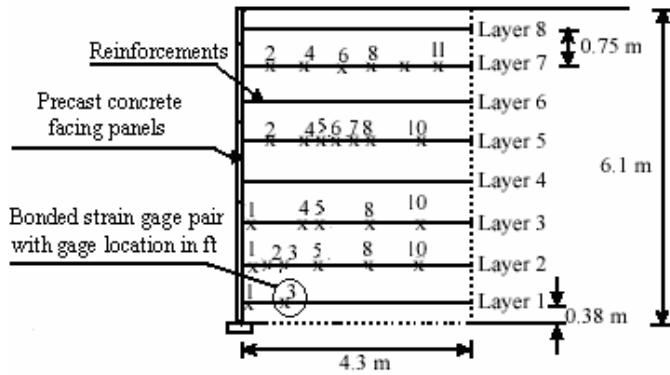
Wall geometry and instrumentation plan (after Lee et al. [1999]).
